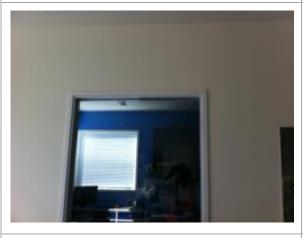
Mitre Joints on the Communication Room Door Architrave have Opened up
